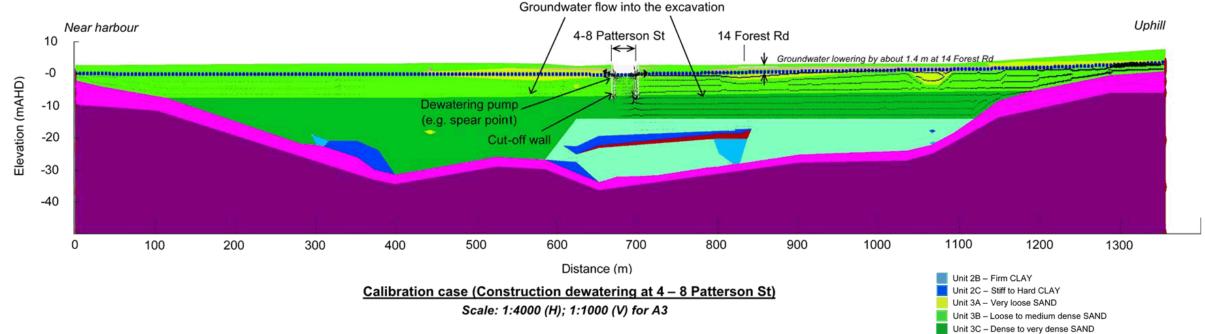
Seepage Analysis showing groundwater drawdown due to the construction dewatering of 4-8 Patterson Rd (Geotechnical Section AA)
